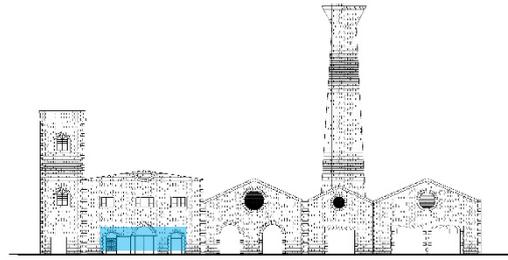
Concrete encroachment on Barrack A, South-east elevation, near doors, arched openings, and openings made on the added level.
